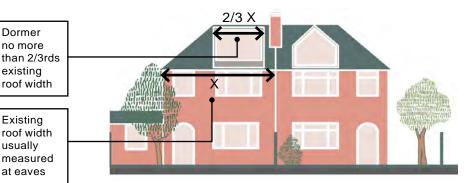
Dormers on a semi-detached or detached house, no more than two thirds the width of the existing roof, and set in from the edge of a hipped roof (or a gable end).
